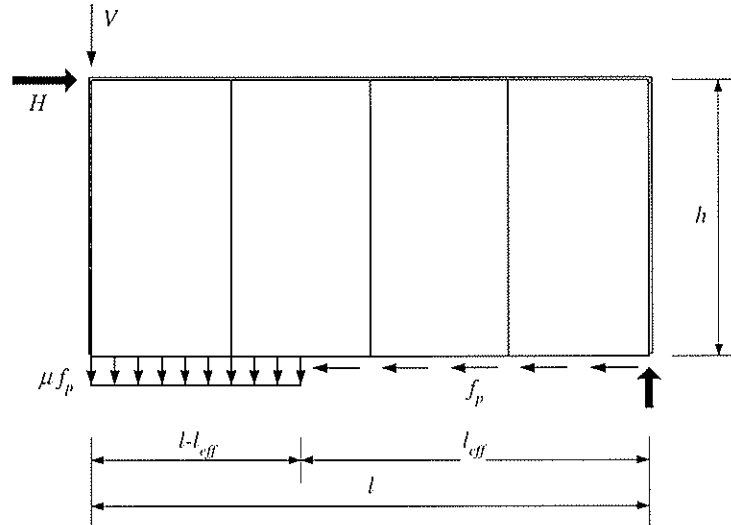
Forces acting on a shear wall in the case of a fully anchored bottom rail and a vertical load on the leading stud.
